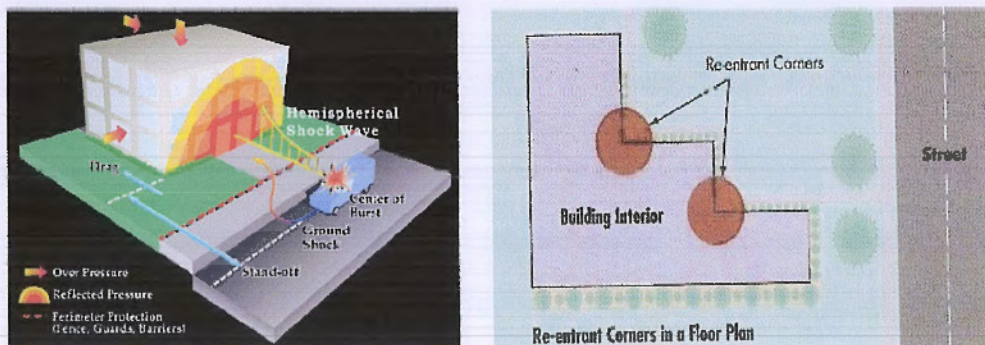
Re-entrant corners should be avoided in the exterior of a building so it can better resist shockwave
